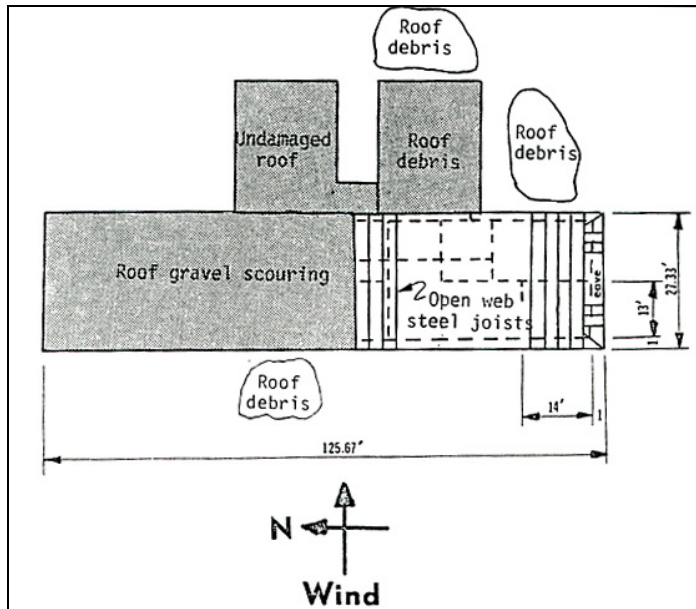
Roof plan diagram of the Communications Building. The damaged area of the roof is not shaded. Flat roof was comprised of lightweight concrete deck that was tied to open web steel joists.
